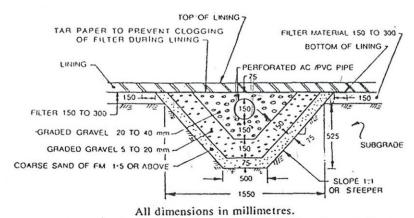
Typical Section of Longitudanal/Transverse Drain (Pressure Relief Valve Not Shown)
